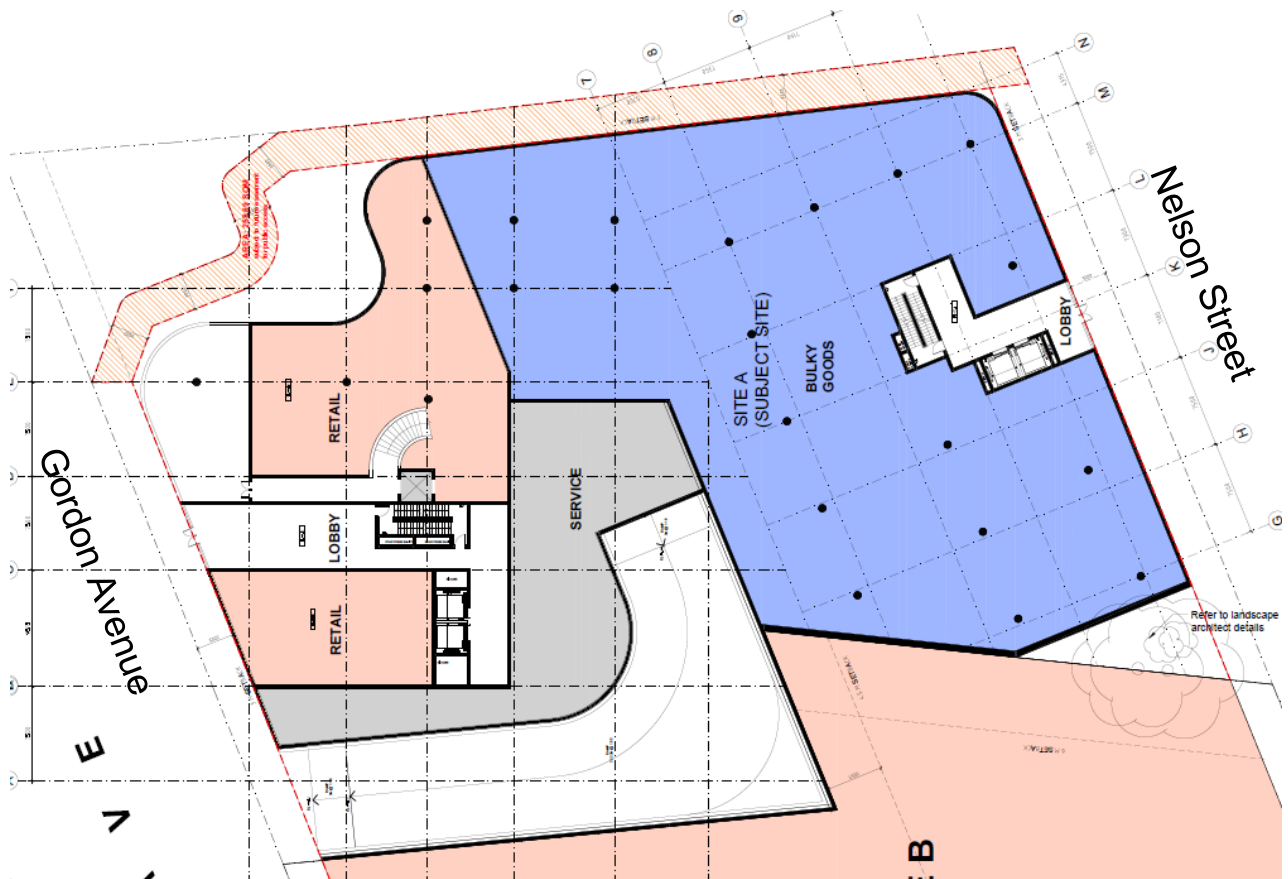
Reference scheme plan view. Tower A – proposed height of 25 storeys, Tower B – proposed height of 20 storeys (source: Urbis)
